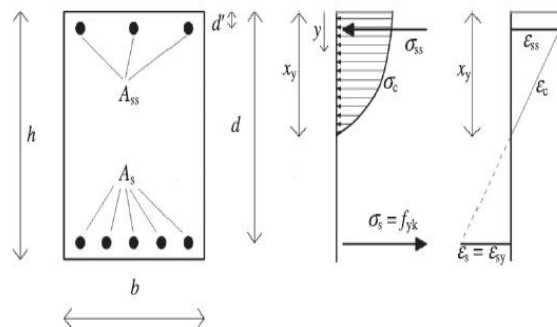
Sketch of cross section of doubly reinforced beam with its stress and strain diagram.
